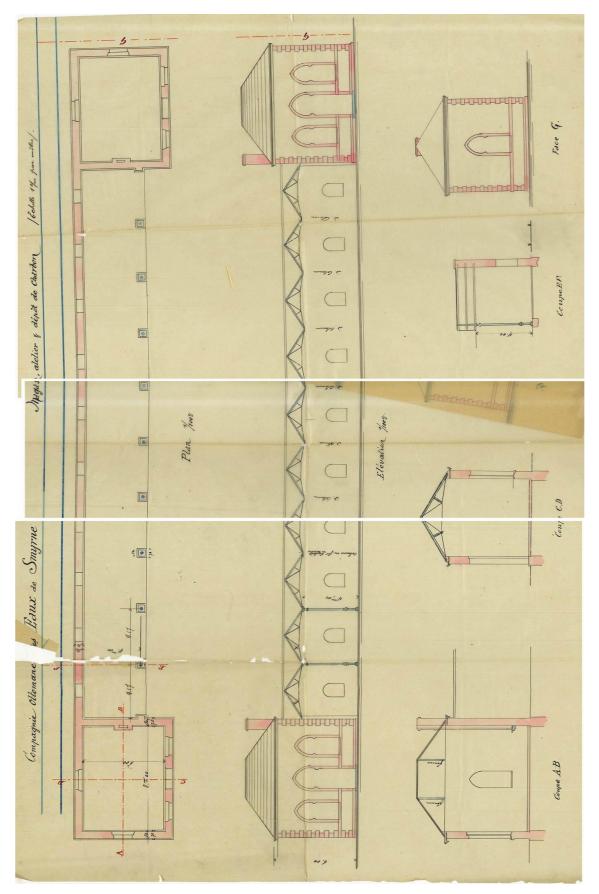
Archive document of Halkapınar Water Pump Station (Original Outbuilding Plan & Elevations & Sections in 1898)
